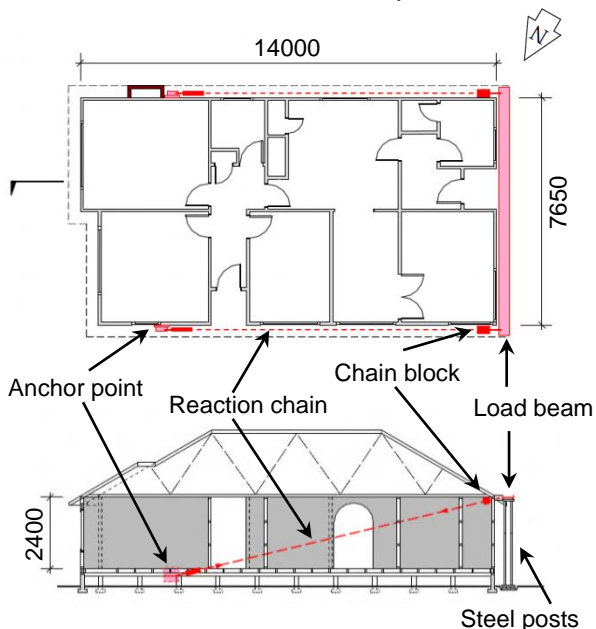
Floor plan and section of Bexley Rd. with test rig in place. All dimensions in mm. By L. Holt.
